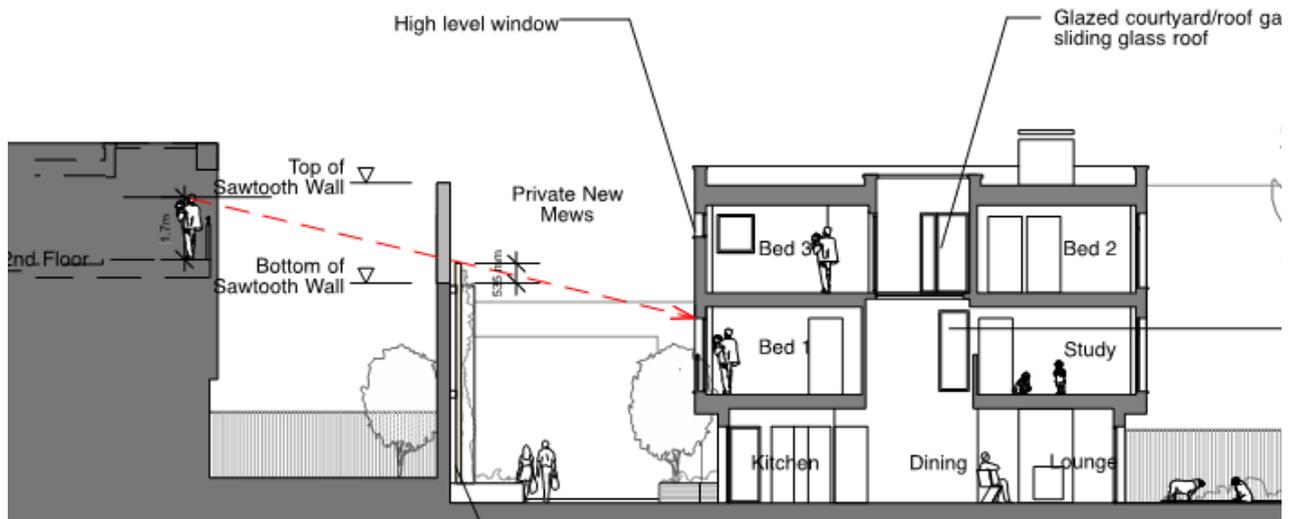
Proposed Section drawing showing the retained wall and additional timber screen between the existing and proposed houses, and potential views from the balconies at 6-22 Melody Lane.
